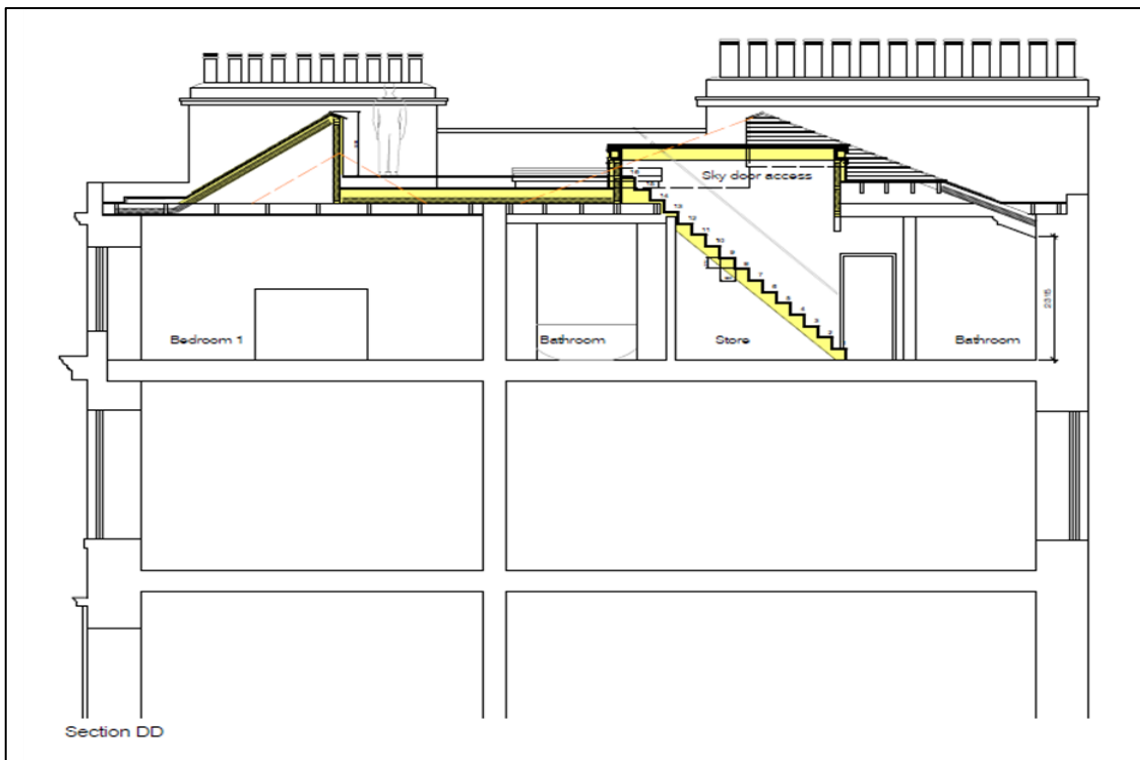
Proposed Sections (Richard Murphy Architects, Drawing No. AL/02/01)
